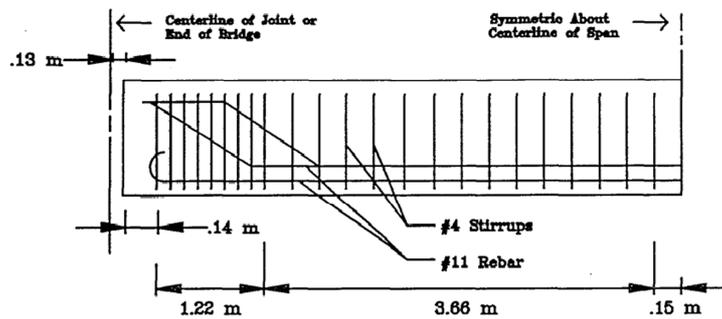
Elevation view of girder showing shear reinforcement 2 <sup>[46]</sup>
